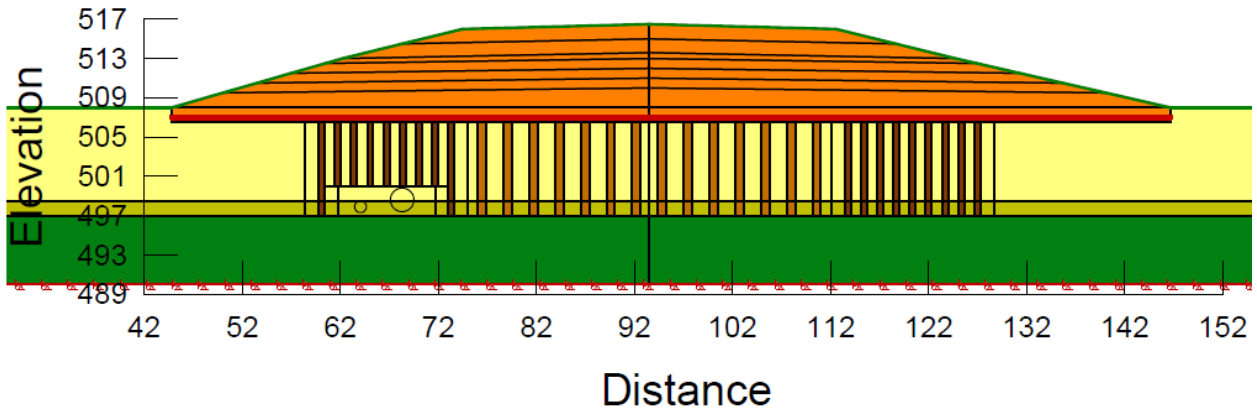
FEM South Abutment Cross-Section Model Completed Stage
